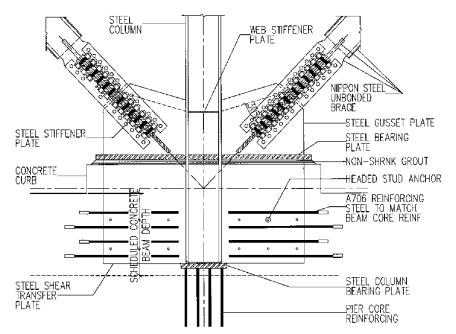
a. Exterior shear transfer assembly and brace connection details along grid line 7'.
